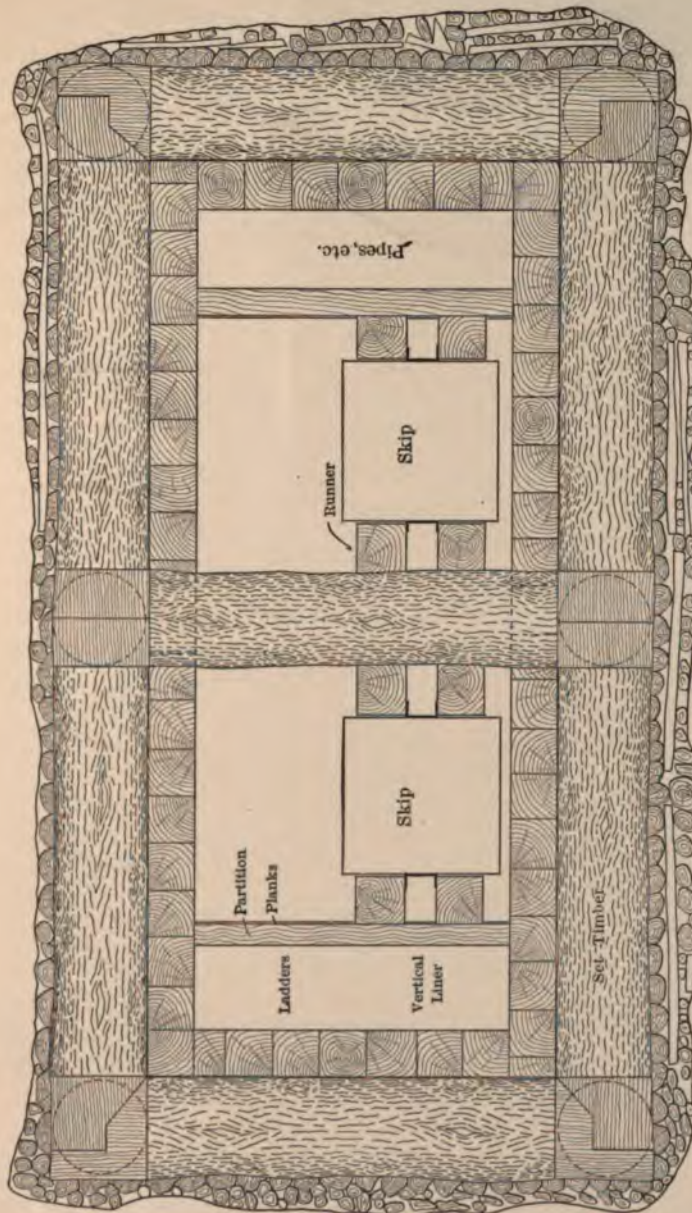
HORIZONTAL SECTION THROUGH SHAFT, SECTION 16 MINE.
